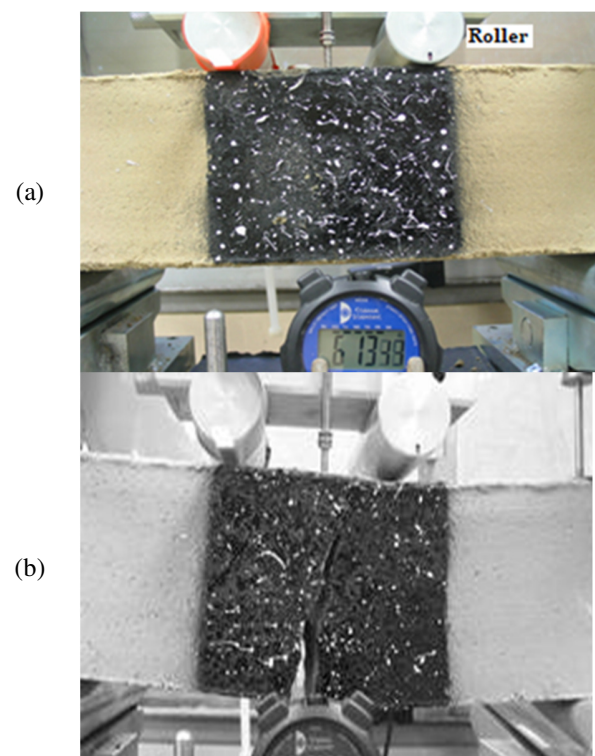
(a) Bending test on a compacted specimen, (b) tensile failure mode in bending test.
